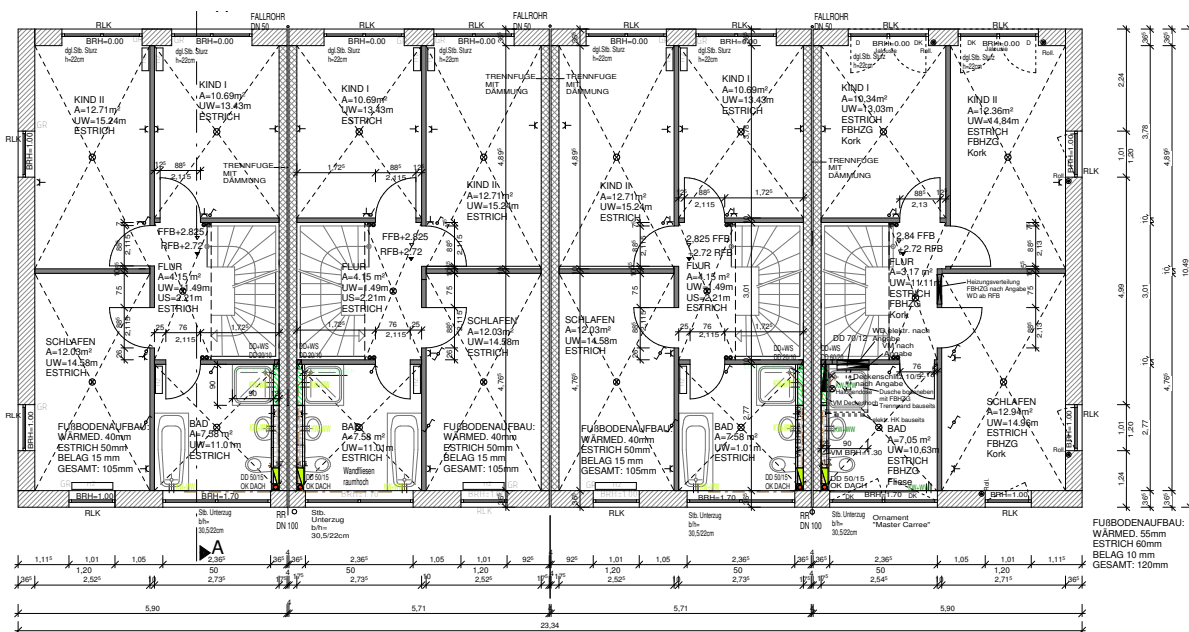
Row house building plan - first floor. There are two “edge” and two “middle” row houses [148].
